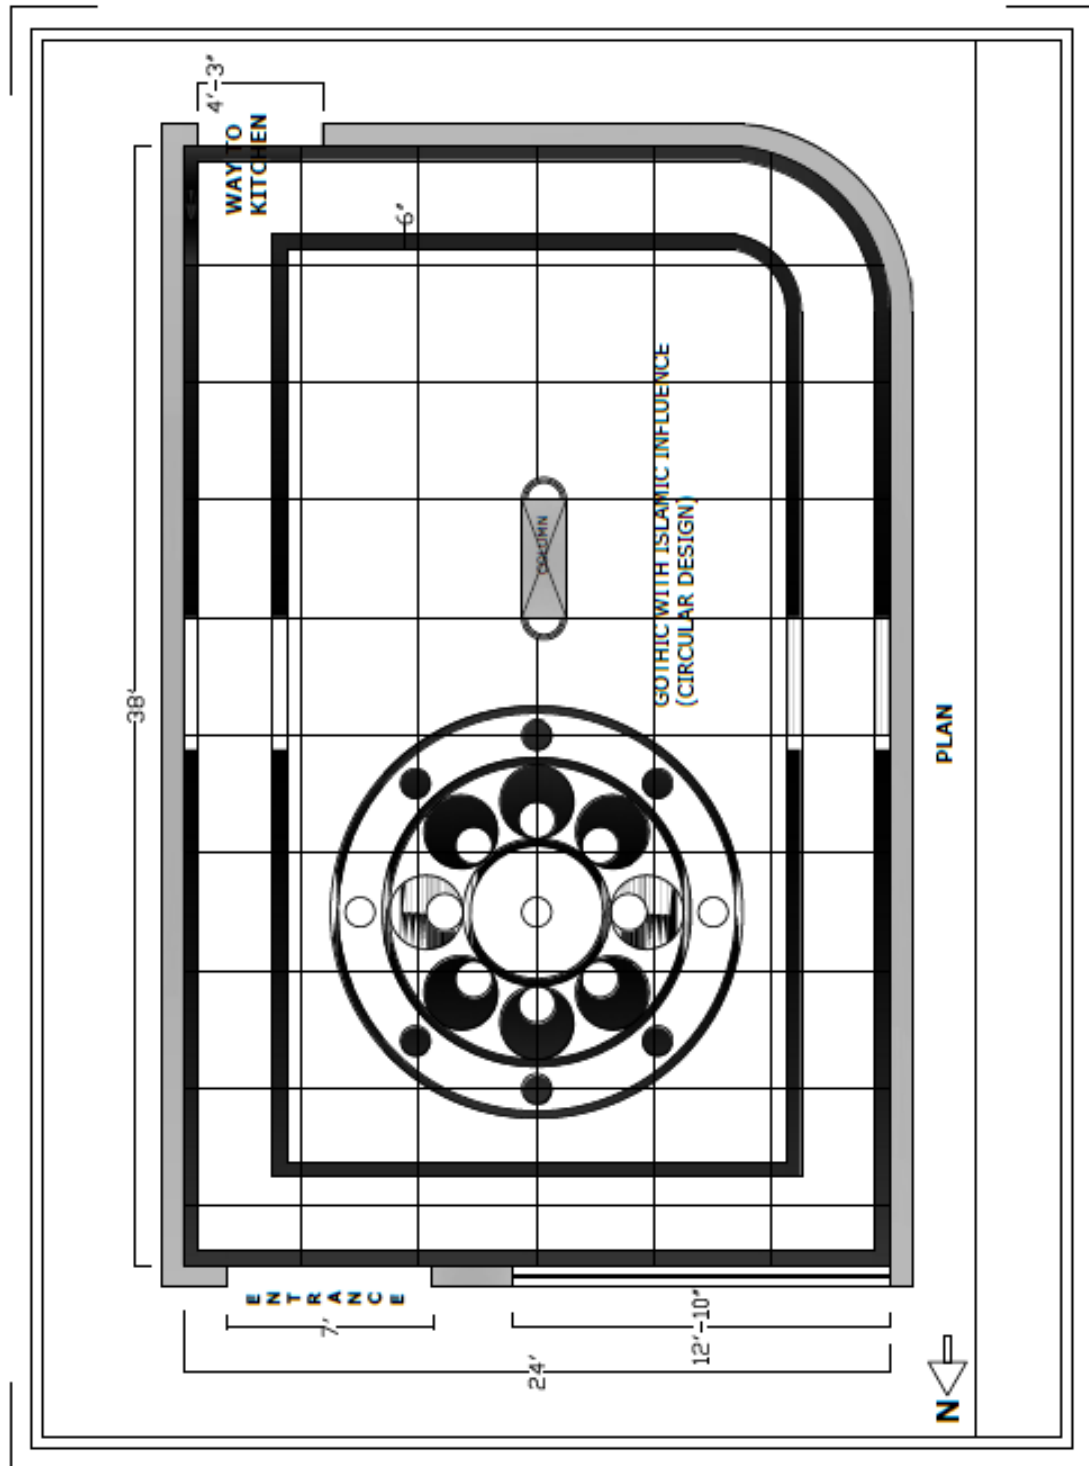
FLOOR PLAN OF THE EXISTING RESTURANT
